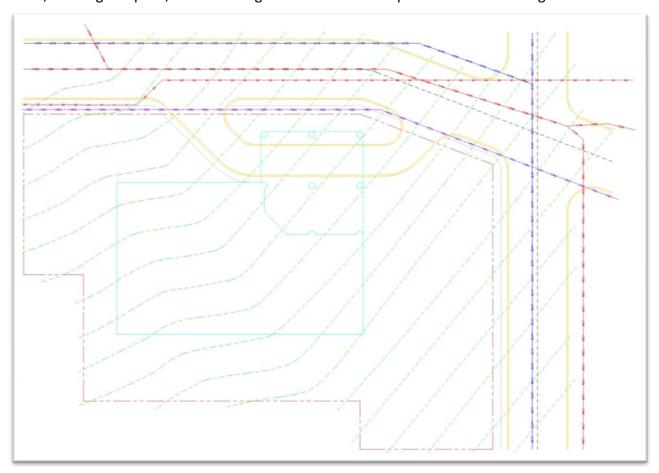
Completed task #5 drawing – a site plan based on a provided PDF file.
